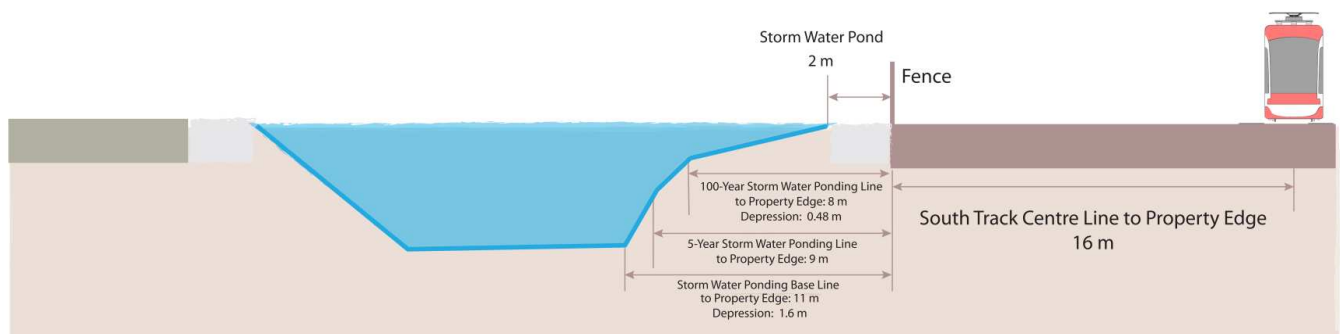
Development Cross-Section of the Proposed Stormwater Ponding Area (Parsons, 2026).
